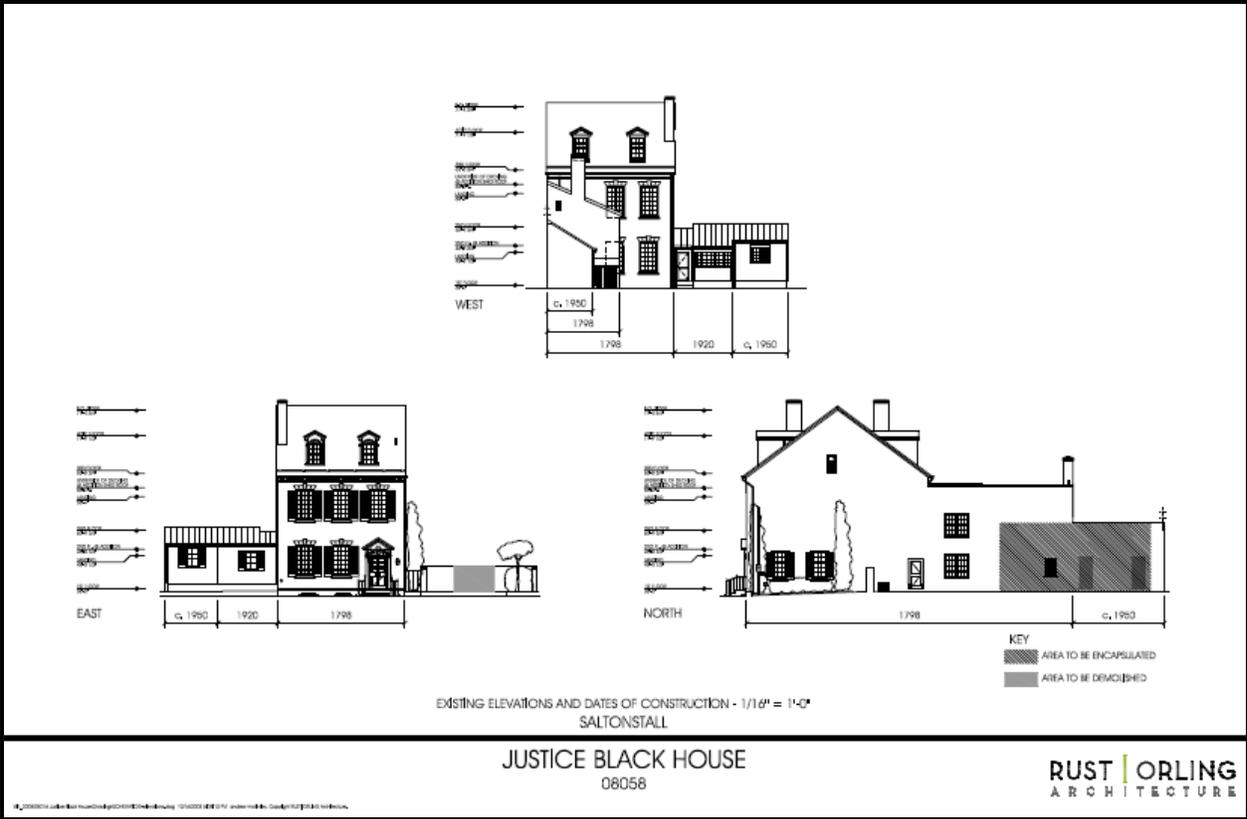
Existing Elevations and Proposed Demolition/Encapsulation
